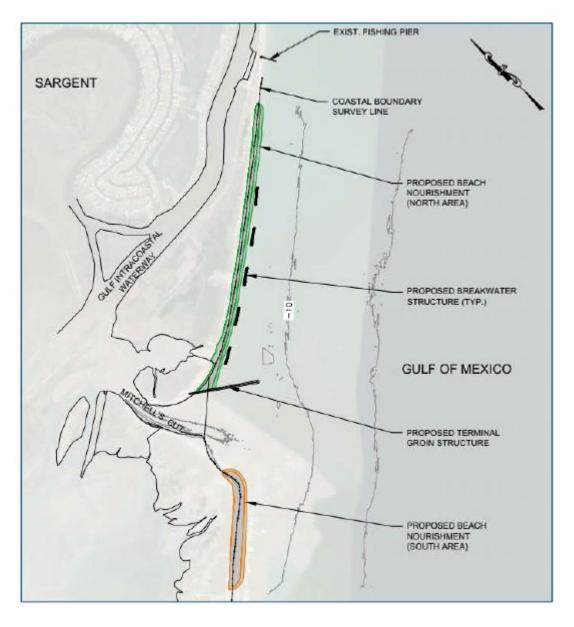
Proposed Plan for Sargent Breakwaters and Nourishment Project (2020)
